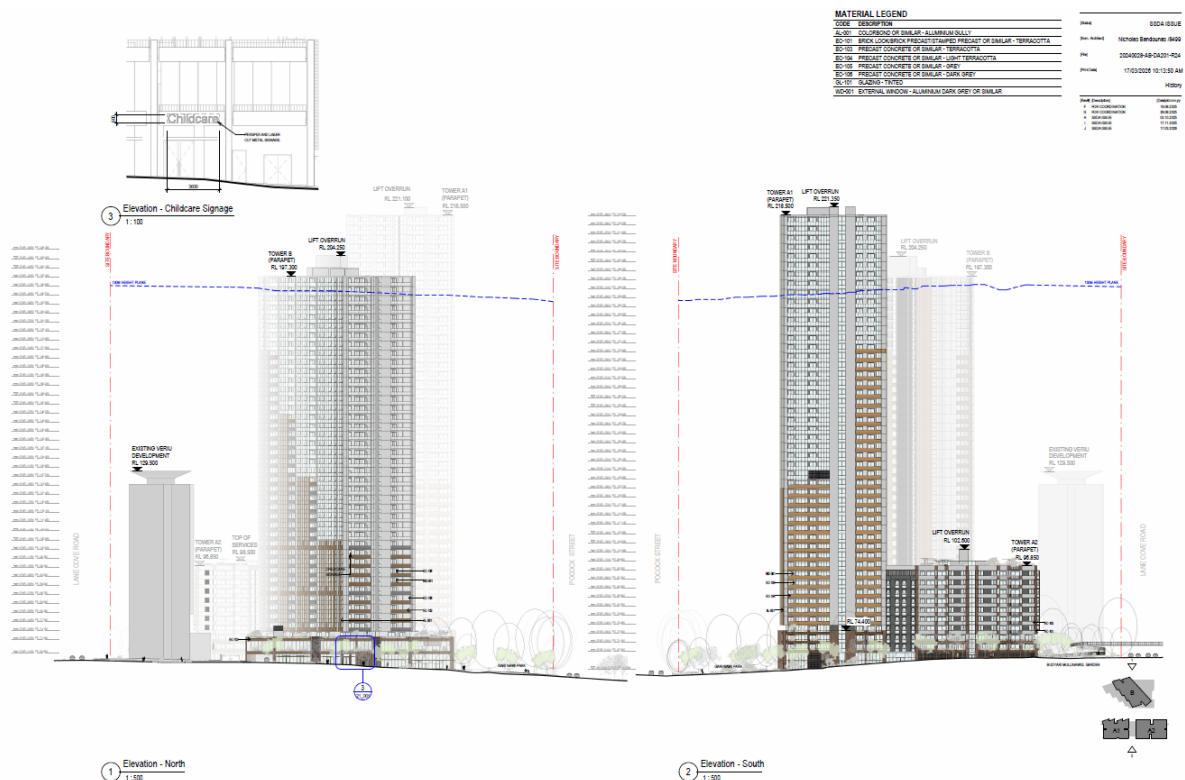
Proposed Elevations (North view to left and South view to right)
